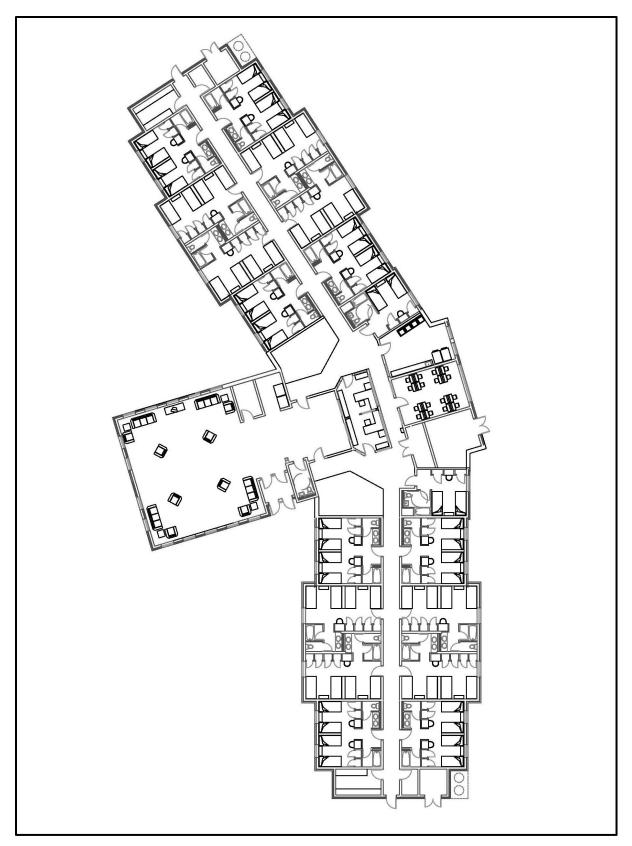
Proposed Action Alternative, 68-Bed I-Type Prototype Floor Plan
